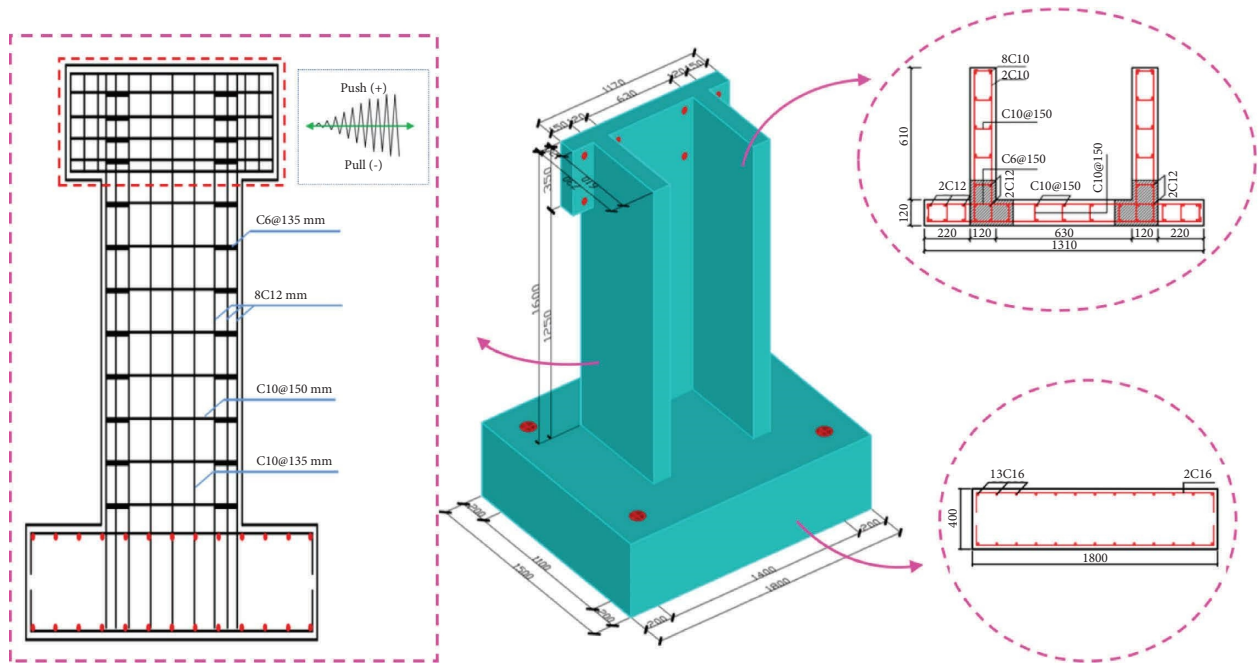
URC-Y shear wall specimens and reinforcement diagram.
